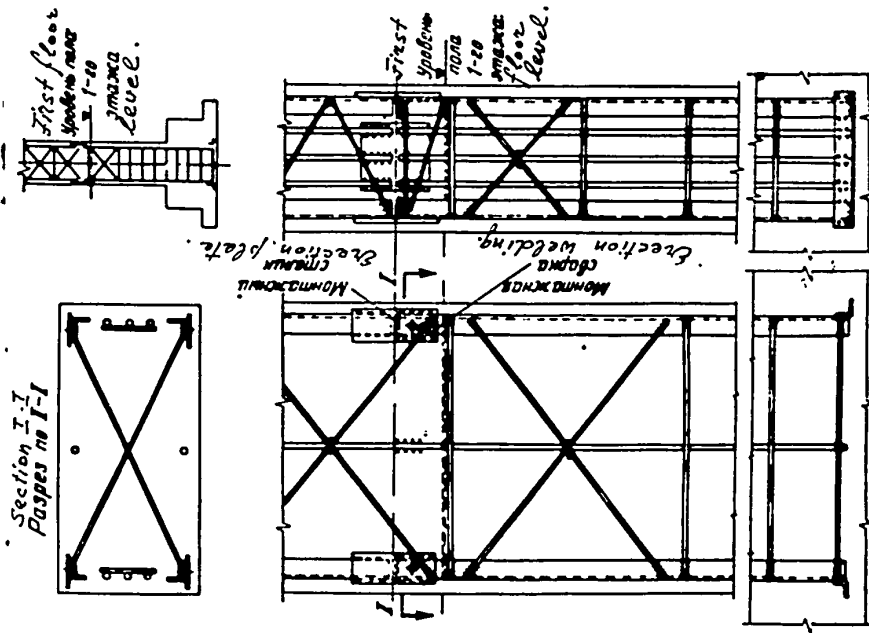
Connection of the skeletons of the column and the foundation footing at the level of the first story.
